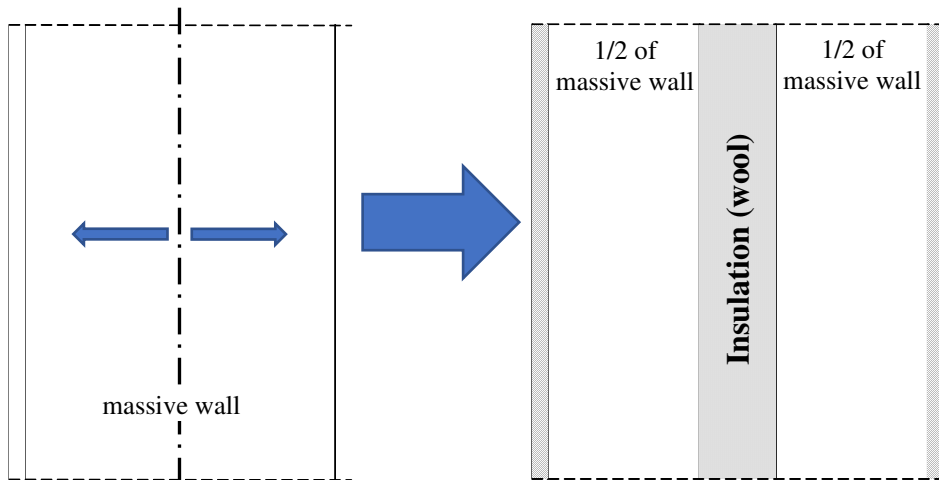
Concept of a double massive wall ("cavity wall") between rooms in a building
